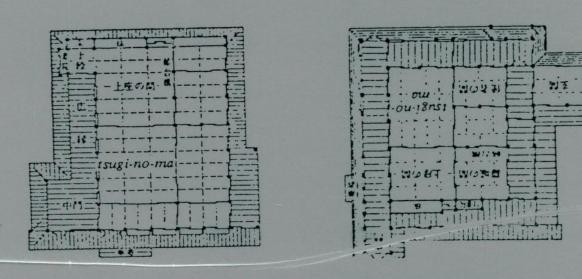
TYPICAL, PLANS SHOW THE PLACEMENT OF TSUGI-NO-MA.
